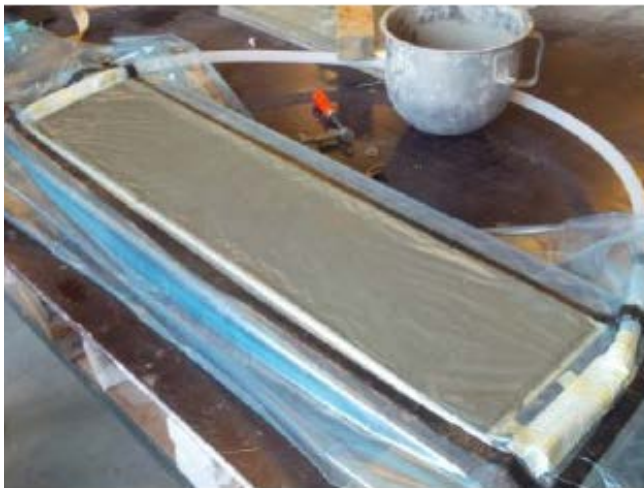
Developable concrete strip - Horizontal element transformed into arch
